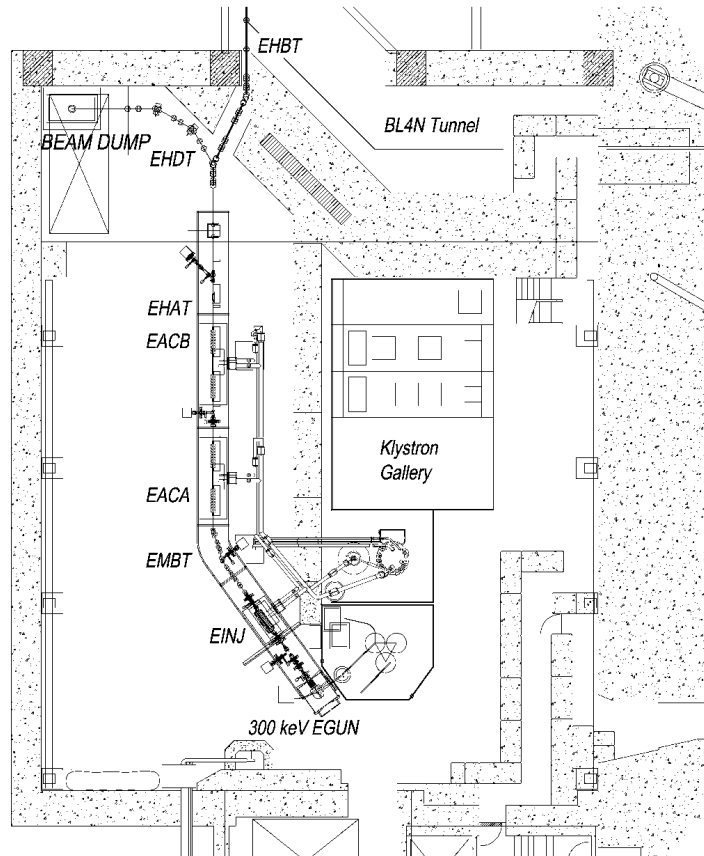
E-Linac equipment layout for the Electron Hall. The schematic is at the 264' elevation except for the maze exit in the NE (top right) corner which is at the 284' elevation on top of the BL4N shielding blocks. [An up-to-date beamline layout showing the locations of analyzing dumps is included in the Appendix A drawing list.]
